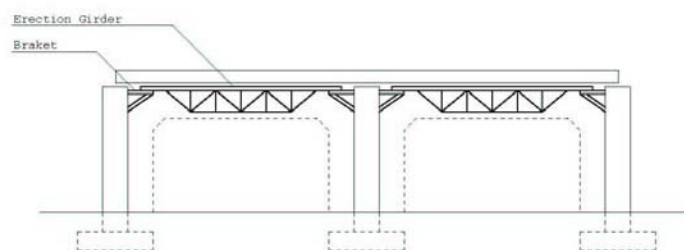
Erection Girder Method for PC hollow slabs
